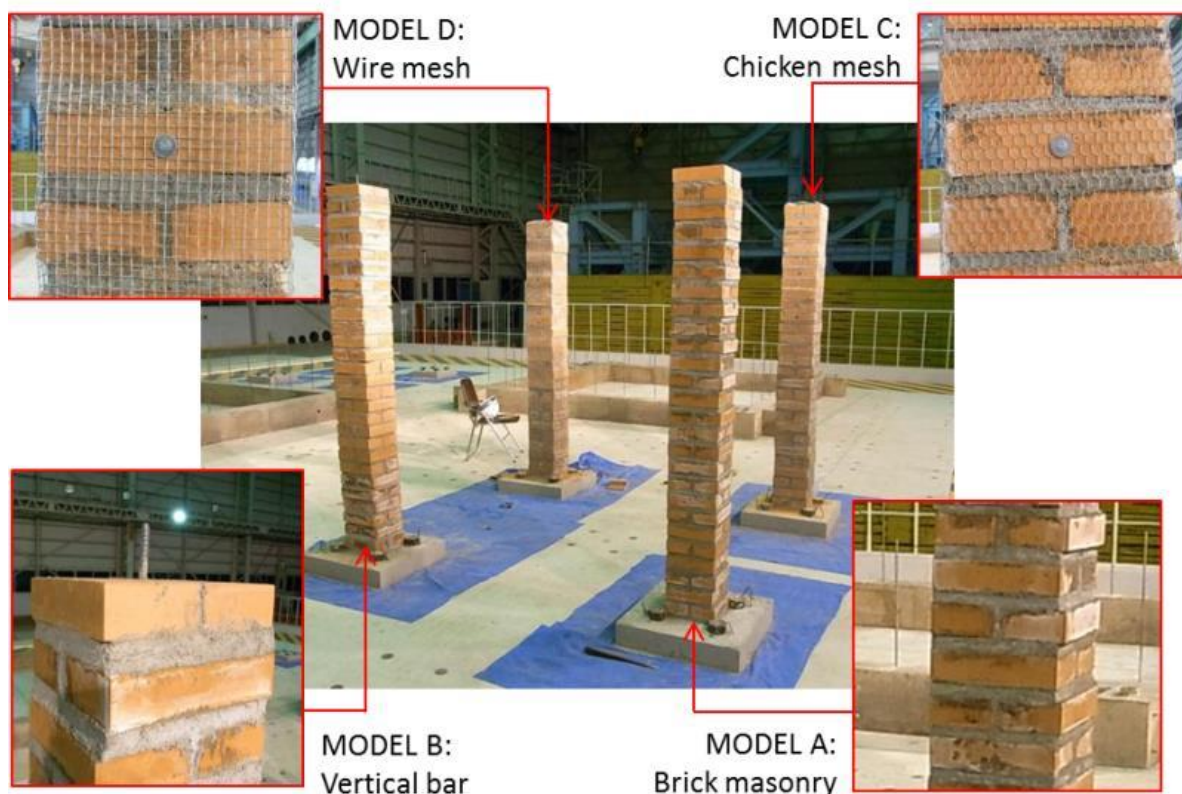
Brick Masonry Column Model (Imai, 2011)
